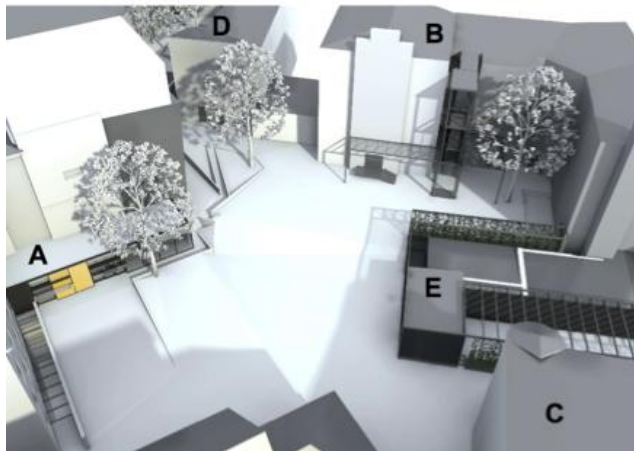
Extension and renovation project of the St. Joseph Hospital in Poznan. View of the inner courtyard. A – admission room B,C,D – existing hospital buildings, E – oxygen room
